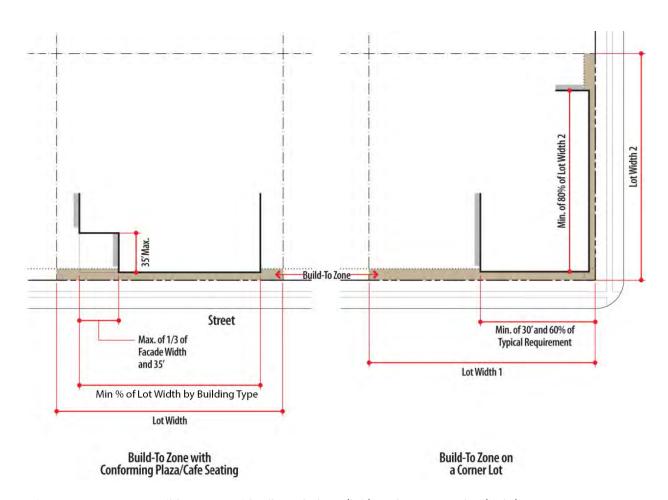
D-1 Build-to zone with allowed plaza (left) and on corner lot (right)
